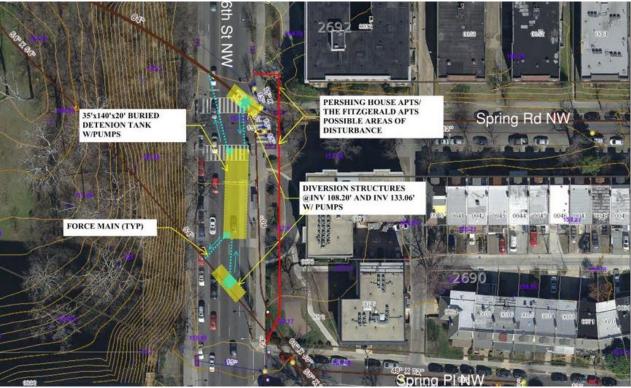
Upstream Storage Tanks with Pump Station – Storage Facility 03
